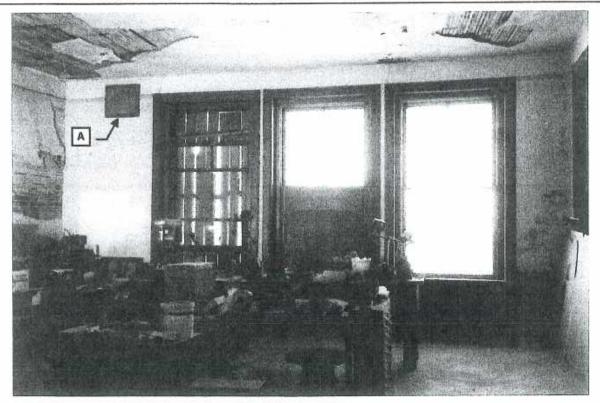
Room 8 view north. (A) North wall upper fresh air gravity vent.
